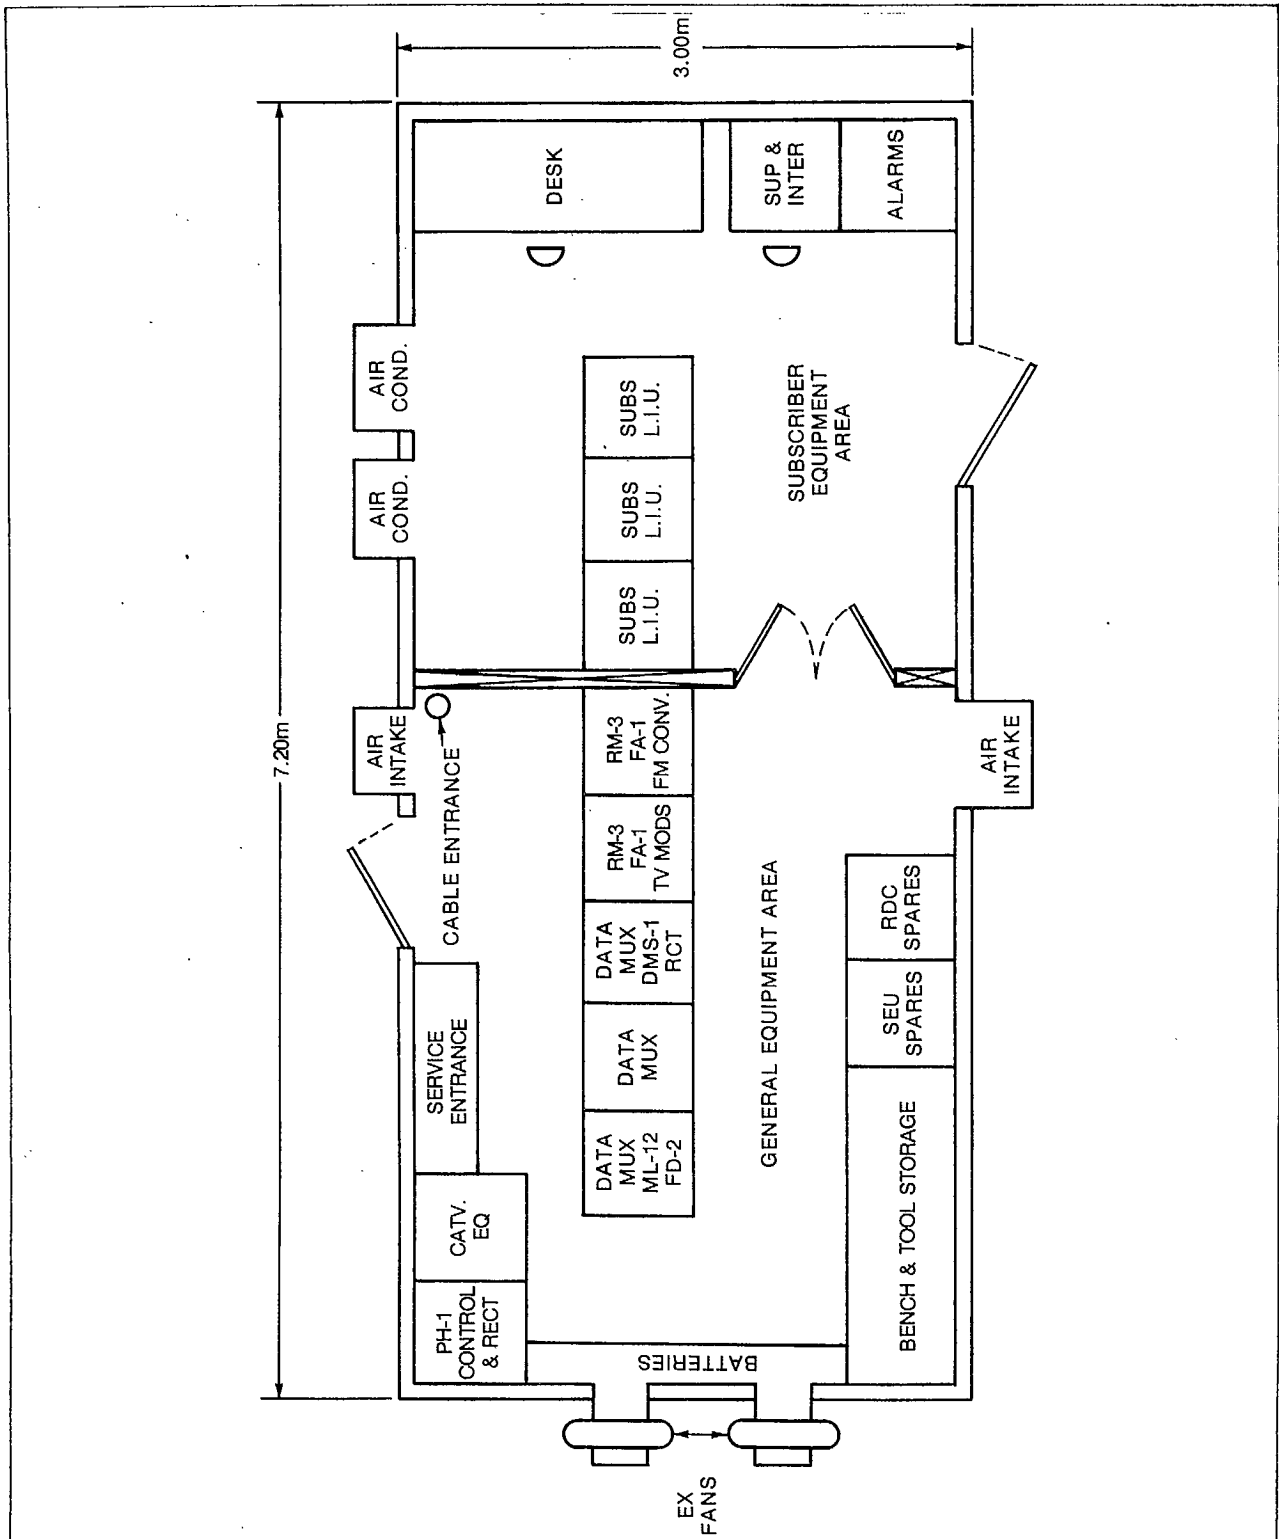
Floor plan and equipment arrangements in the RDC trailer
